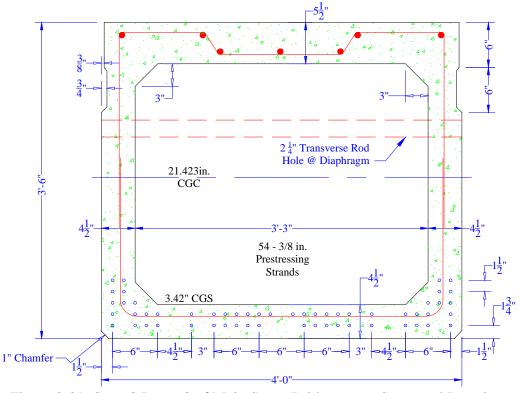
Span 3 Beam 3 of Main Street Bridge as per Structural Drawings
